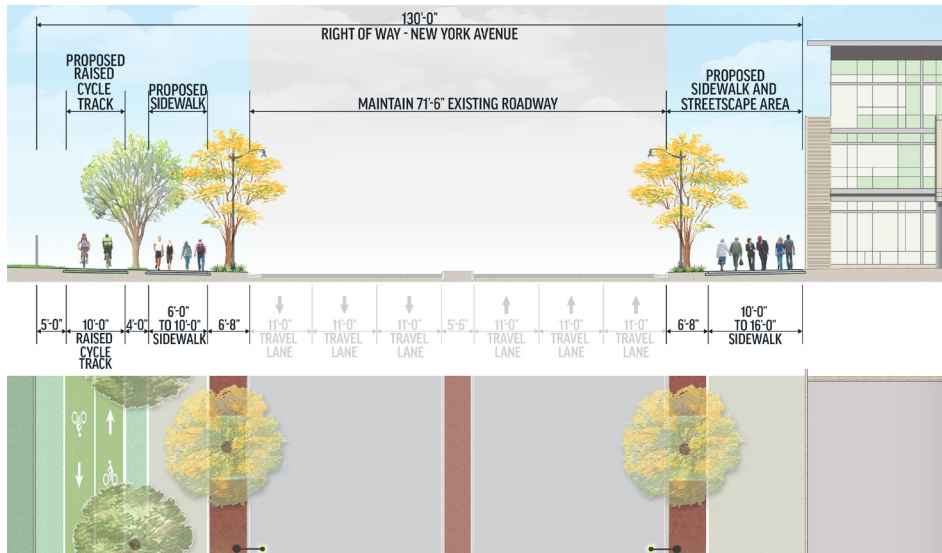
Typical streetscape section of the preferred concept of New York Avenue NE between 4th Street NE and 16th Street NE, excluding the intersection at 9th Street NE Bridge.
